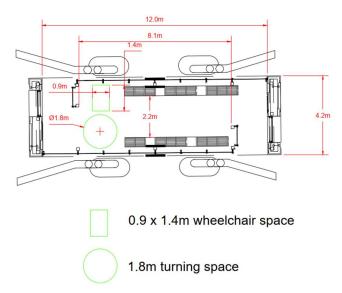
Internal Layout of Bus Shelter (Indicative)
